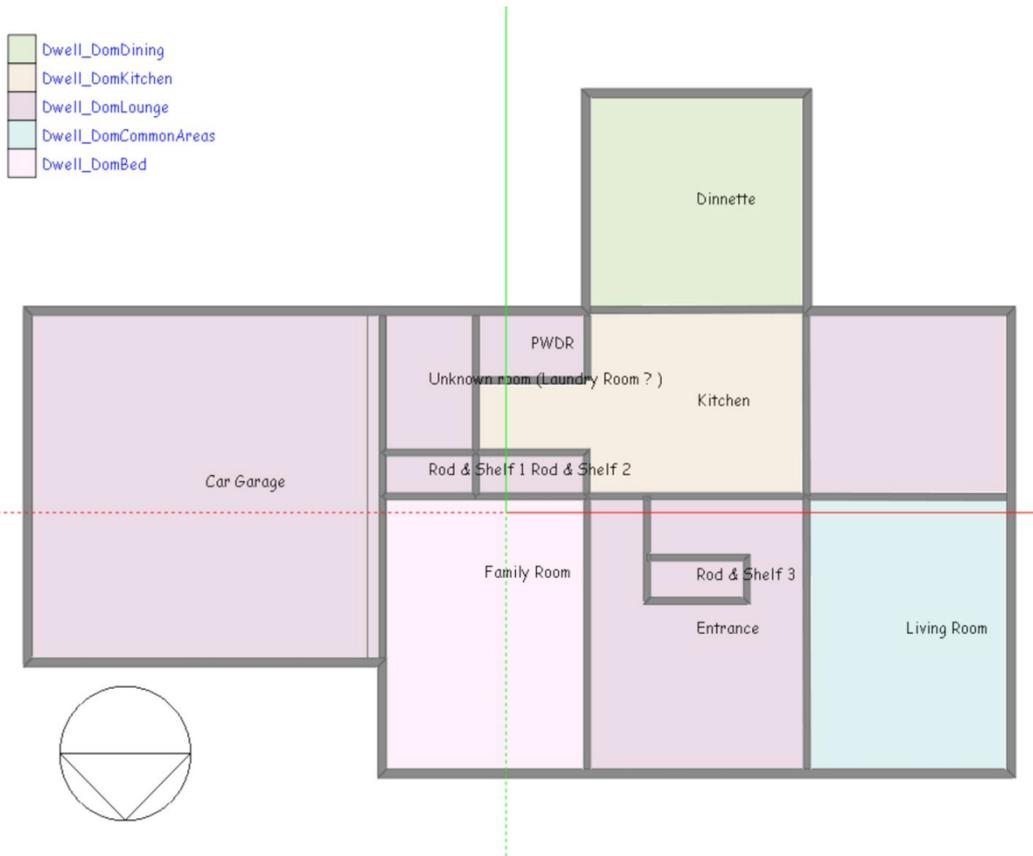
DesignBuilder layout - Floor plan of first floor of MH
